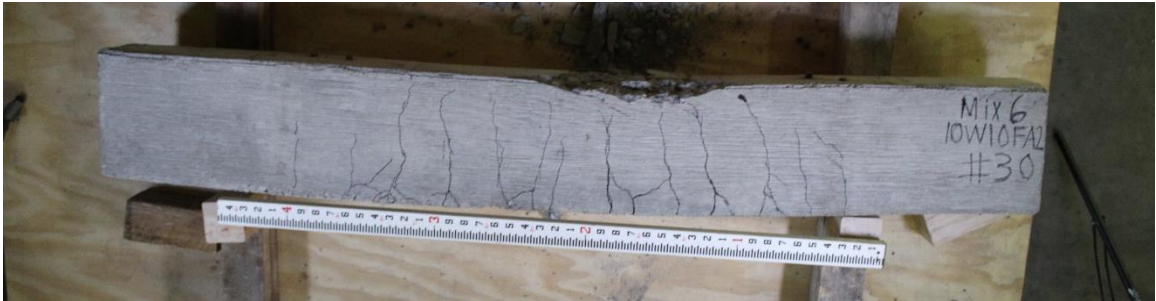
Mixture 6 (10W10FA2) beam #30: concrete beam side view.
